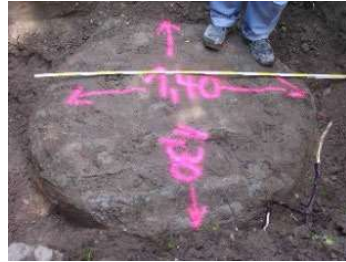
Jet grout columns with 1.35 m diameter in clayey soil
